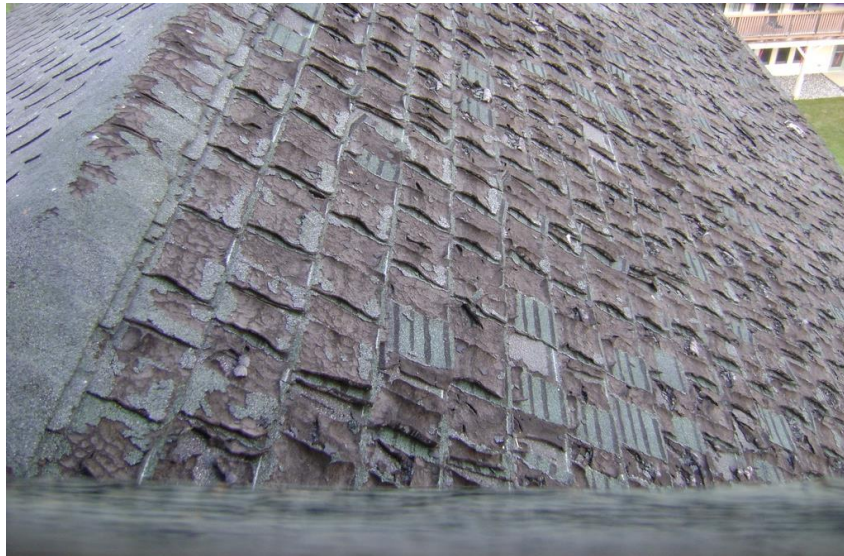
Roof shingles in extreme failure, west side.
